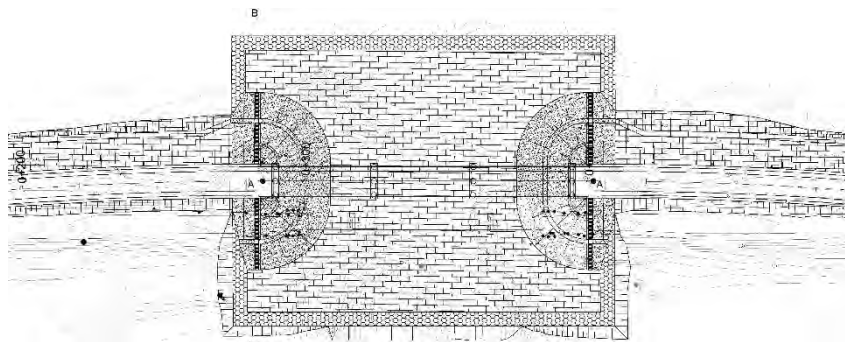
River Bed Protecting Work of Bridges Ba Baong No.2 and Ba Baong No.1
